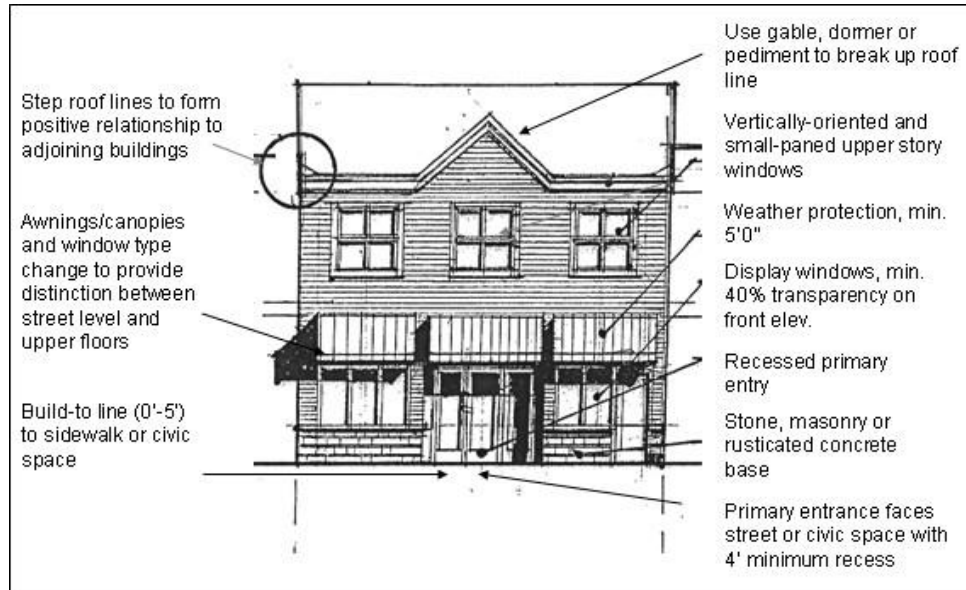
A: Typical Building Elements in Historic Roadside Commercial (Roadside Building Style)
